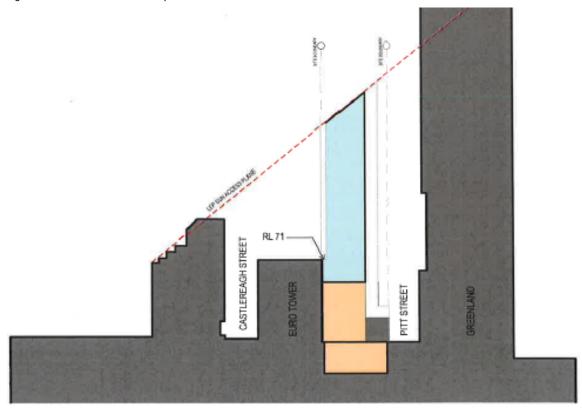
Pitt Street South Concept SSD DA - North South Section
